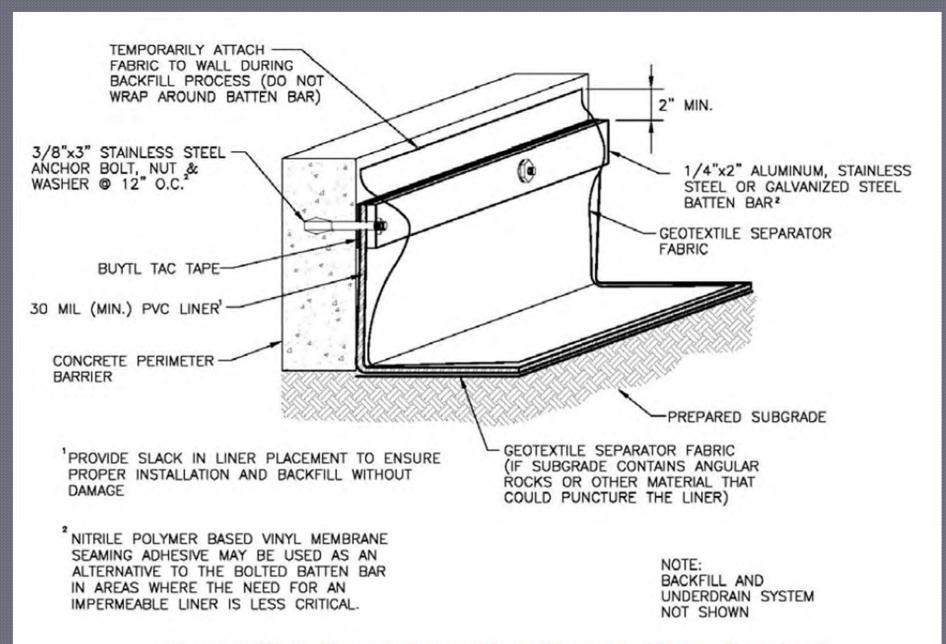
Geomembrane Liner/Concrete Connection Detail
